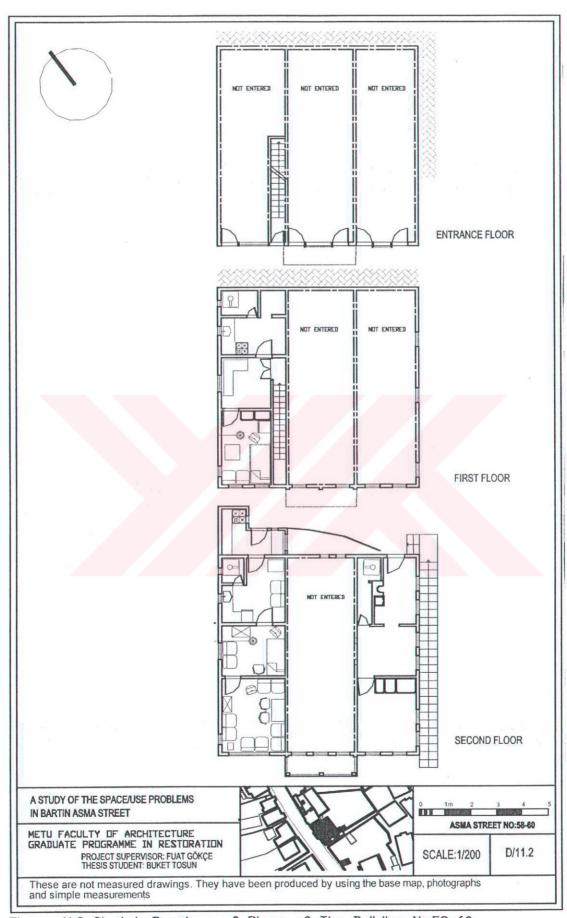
Sketch Drawings of Plans of The Building No:58-60
